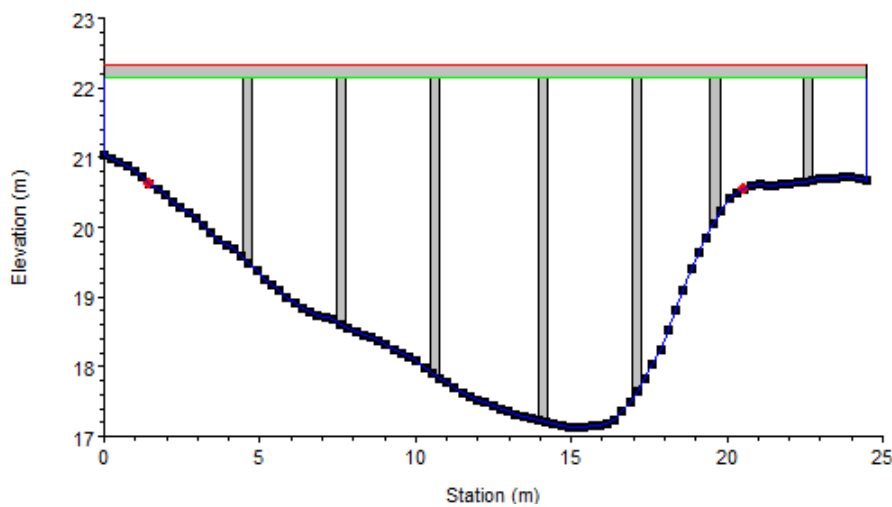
Old Rail Trail Bridge HEC-RAS cross section
